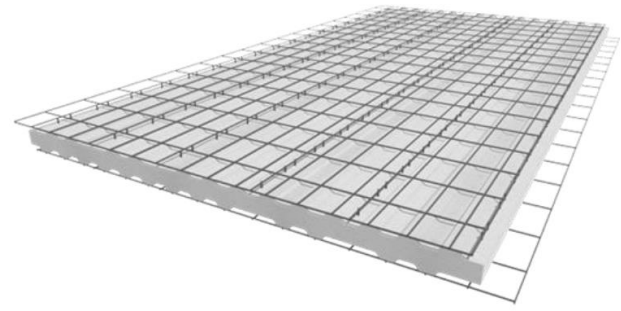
Expanded polystyrene panel wall reinforced with high-strength steel wire tridistructure
